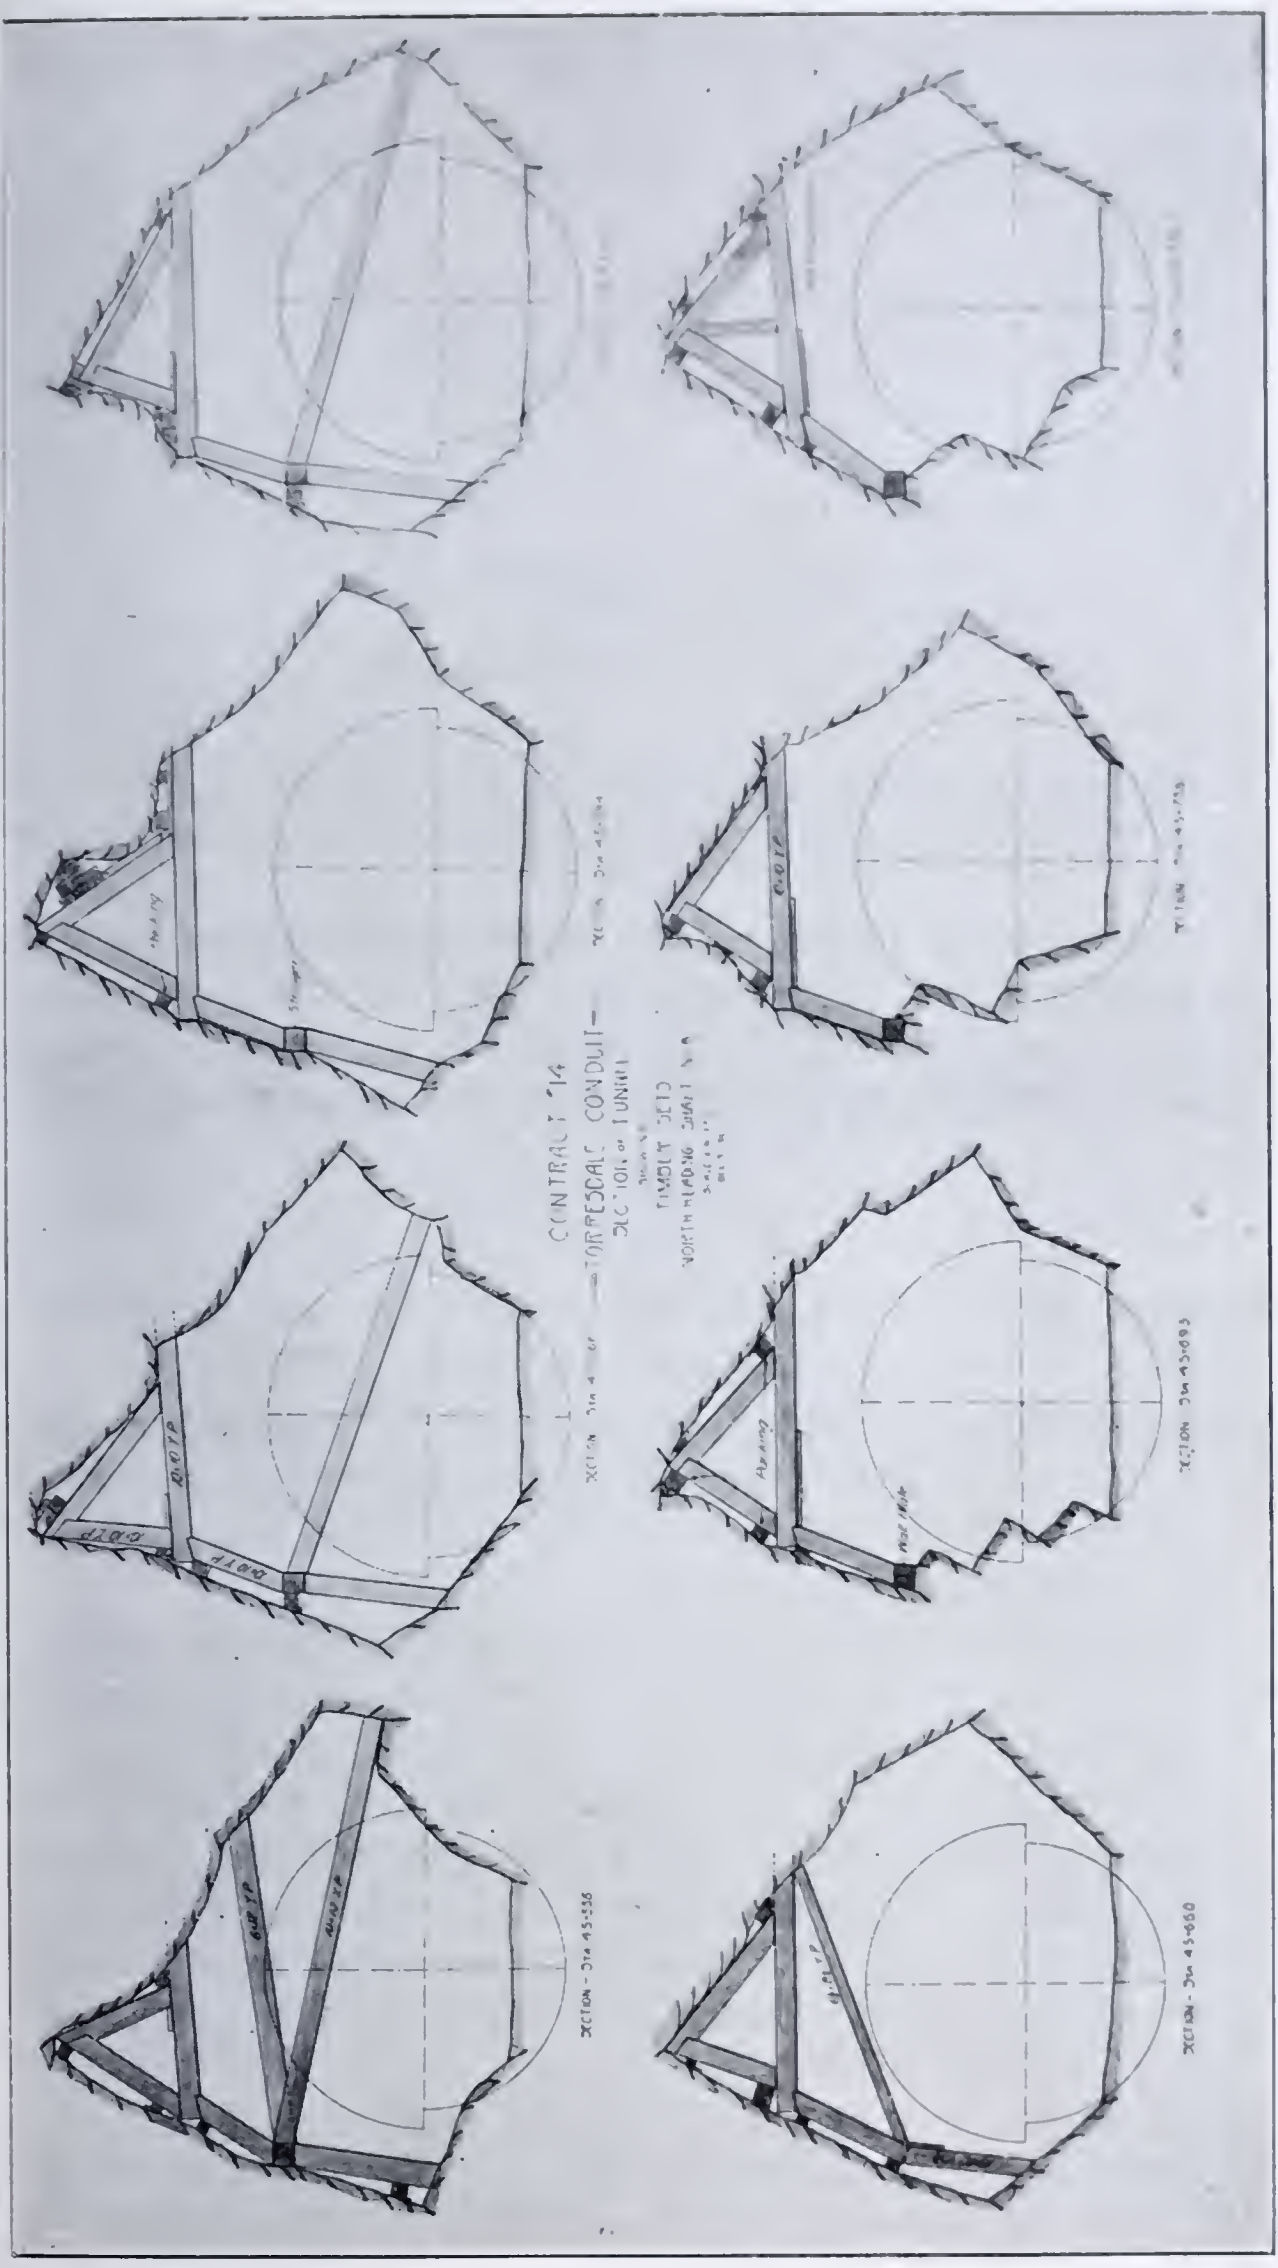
PLATE X.—TIMBER SETS IN NORTH HEADING, SHAFT NO. 8.
